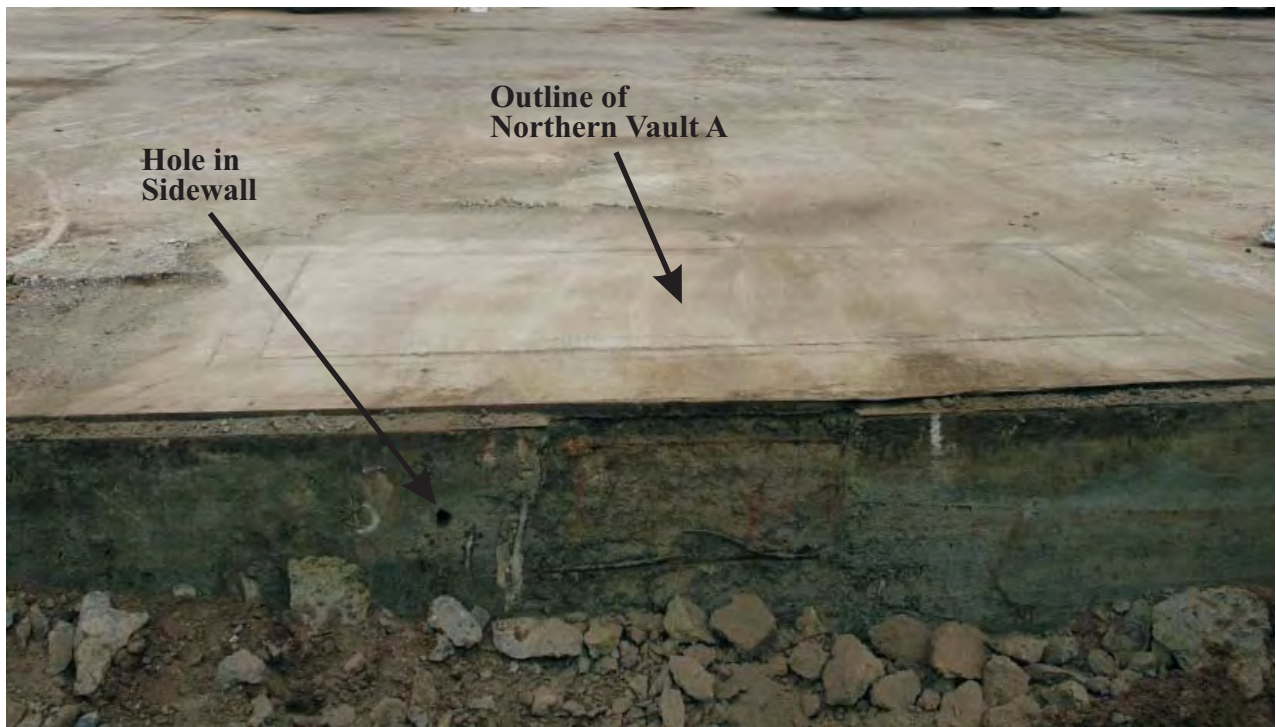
Outline of Northern Vault A (hole in northern sidewall of Frog Pond connected to sump).
